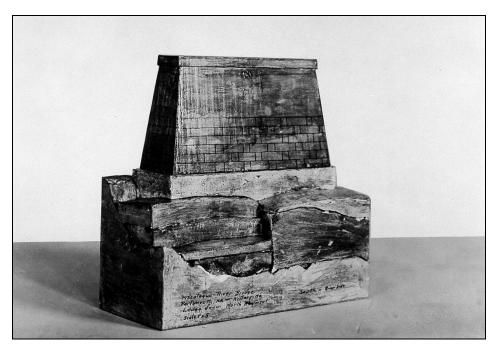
Model of North Abutment (ca. March 1922) Maine DOT
